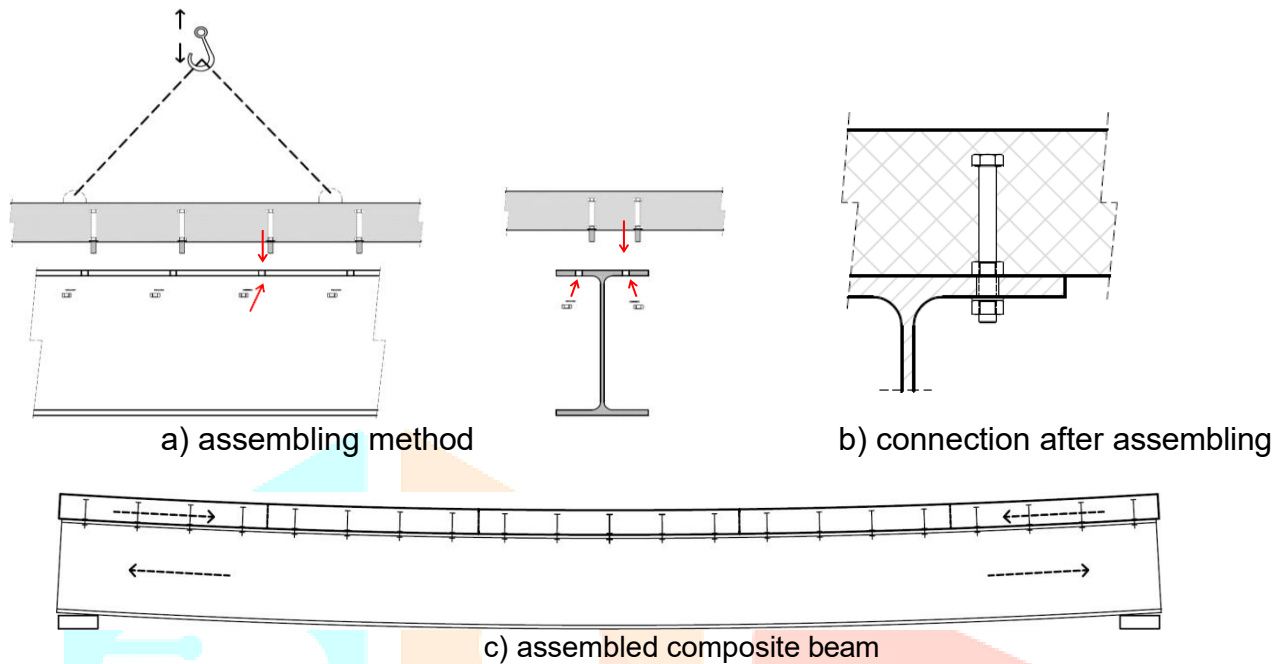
Prefabrication with use of casted bolted shear connectors.
